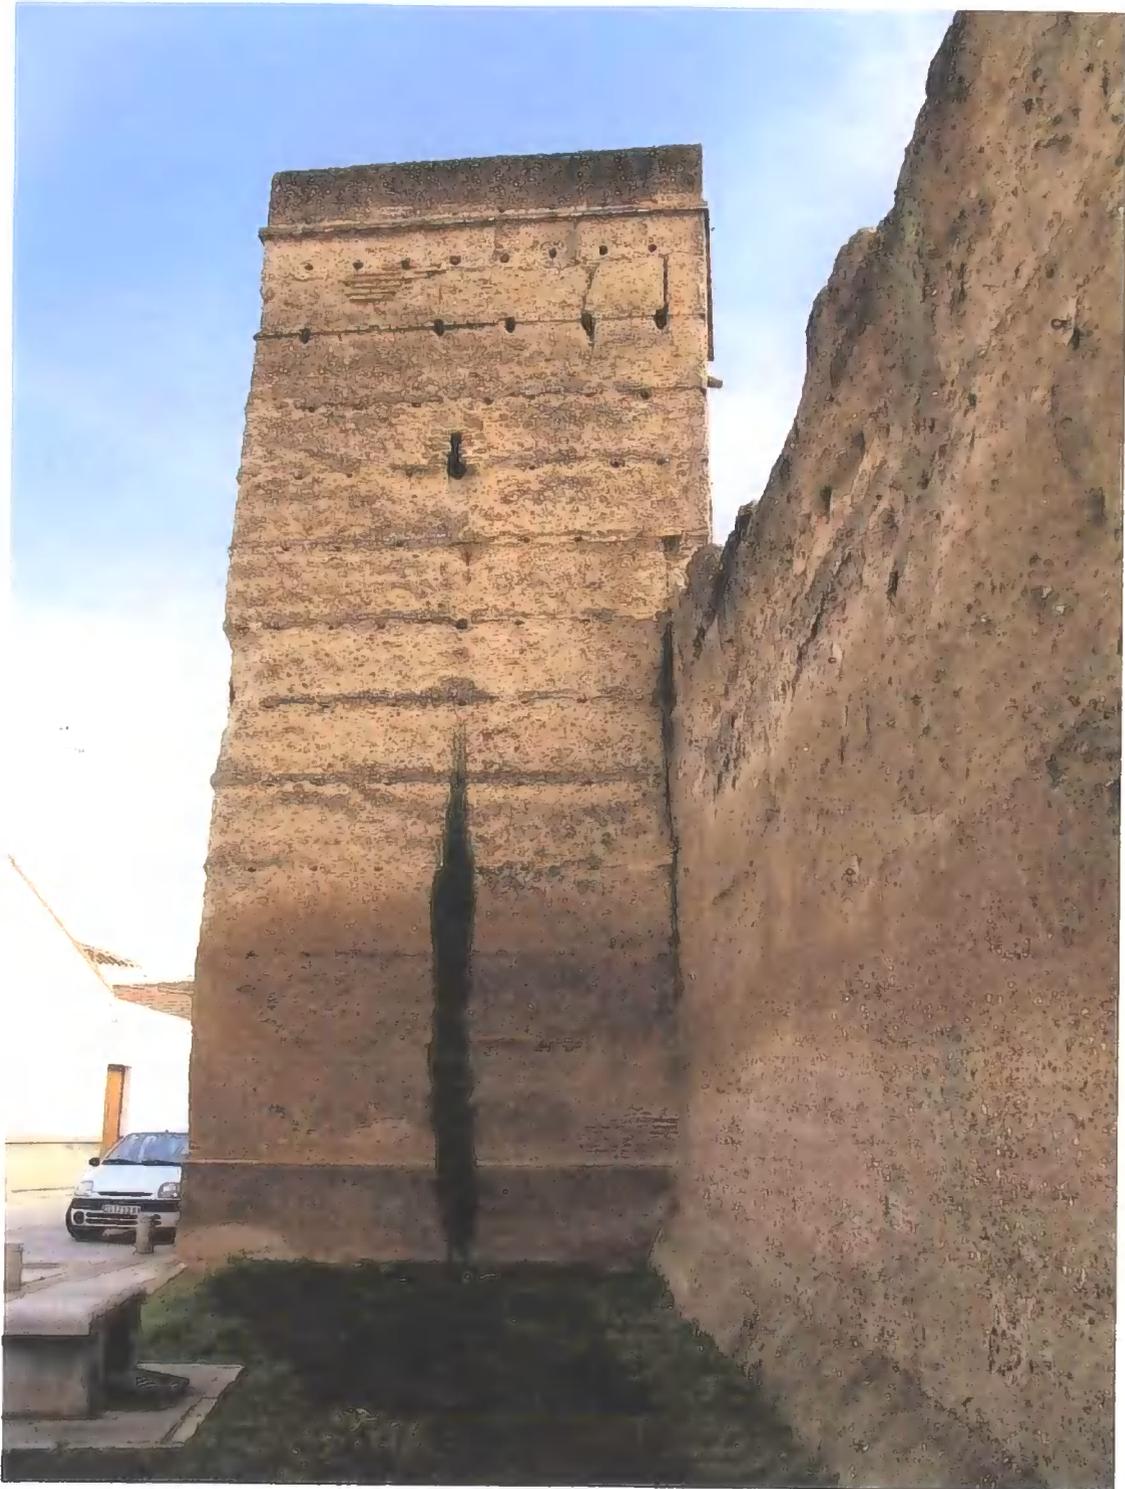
Pa2 Heavily eroded section, Palma del Rio
